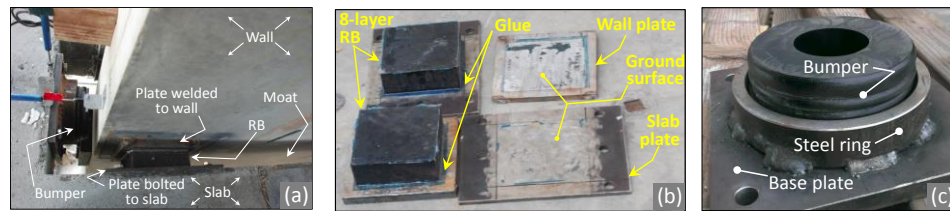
Restoring and limitation devices: (a) specimen layout; (b) RB assembly; (c) bumper.
